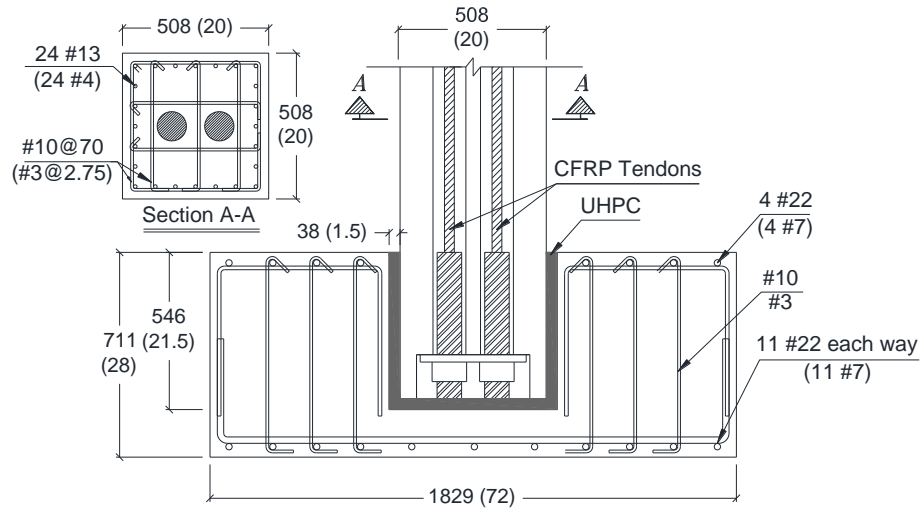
Details of the column-footing pocket connection of the single column model [units are mm (in)]
